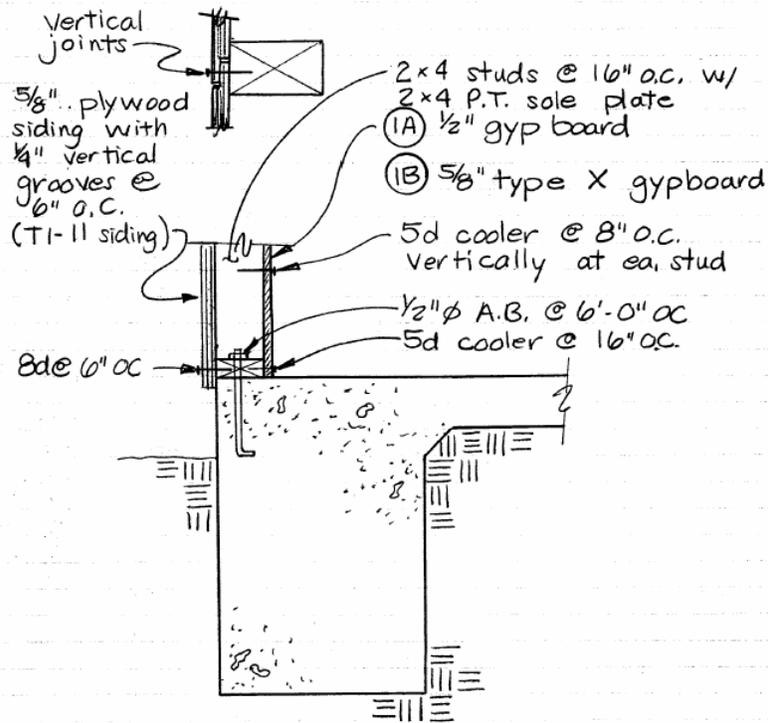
Index building 6 exterior wall section (detail 1-S2)
